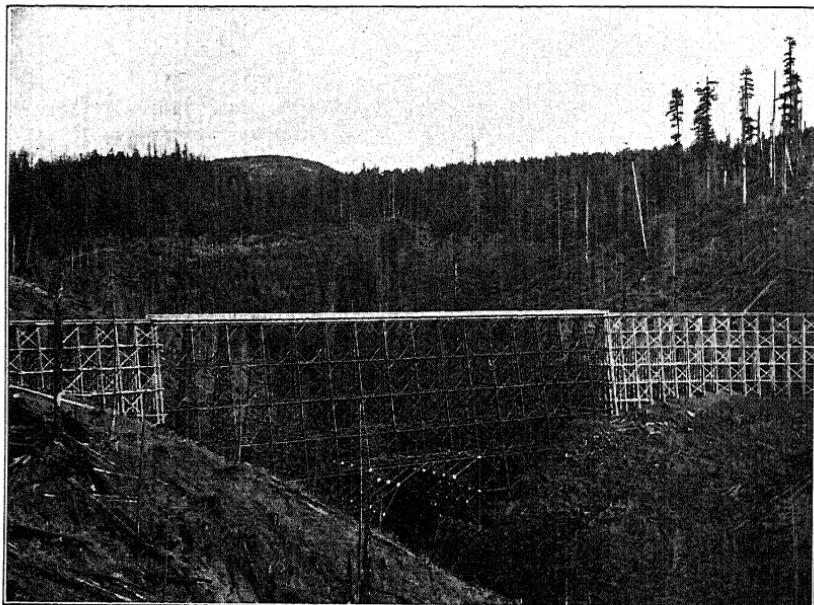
Baird Creek Canyon Bridge constructed for Weyerhauser Timber Company. The bridge has an over-all length of 1130 ft. and a rise of 235 ft.
